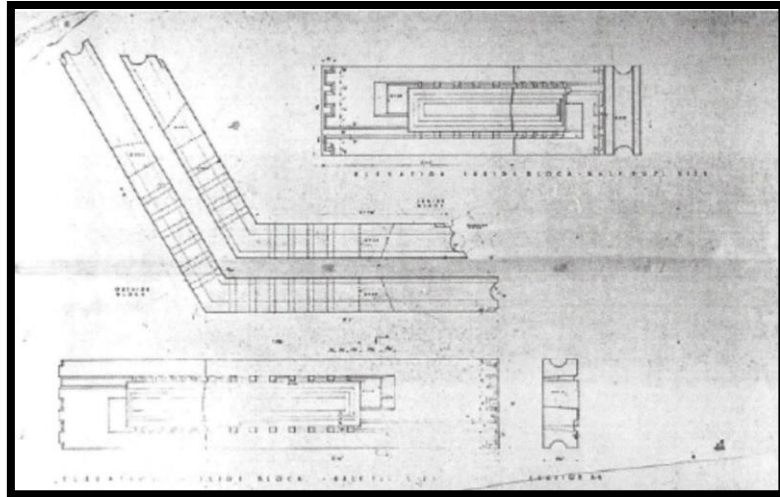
Plans of an obtuse corner block, similar to that which the student is crafting. *Florida Southern College.
